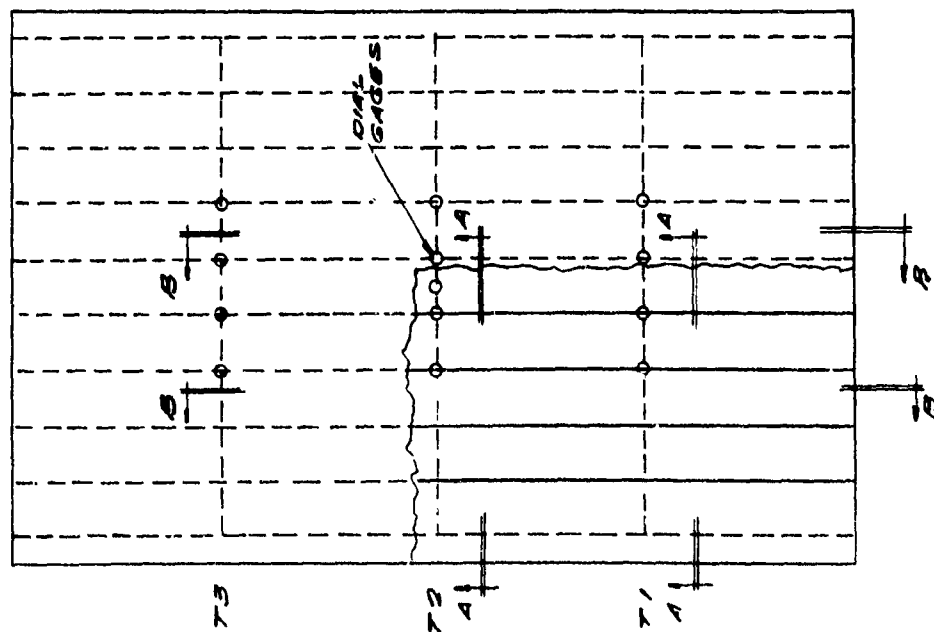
(a). INSTRUMENTATION PLAN FOR PROPOSED SPECIMENS 2, 3 AND 4
